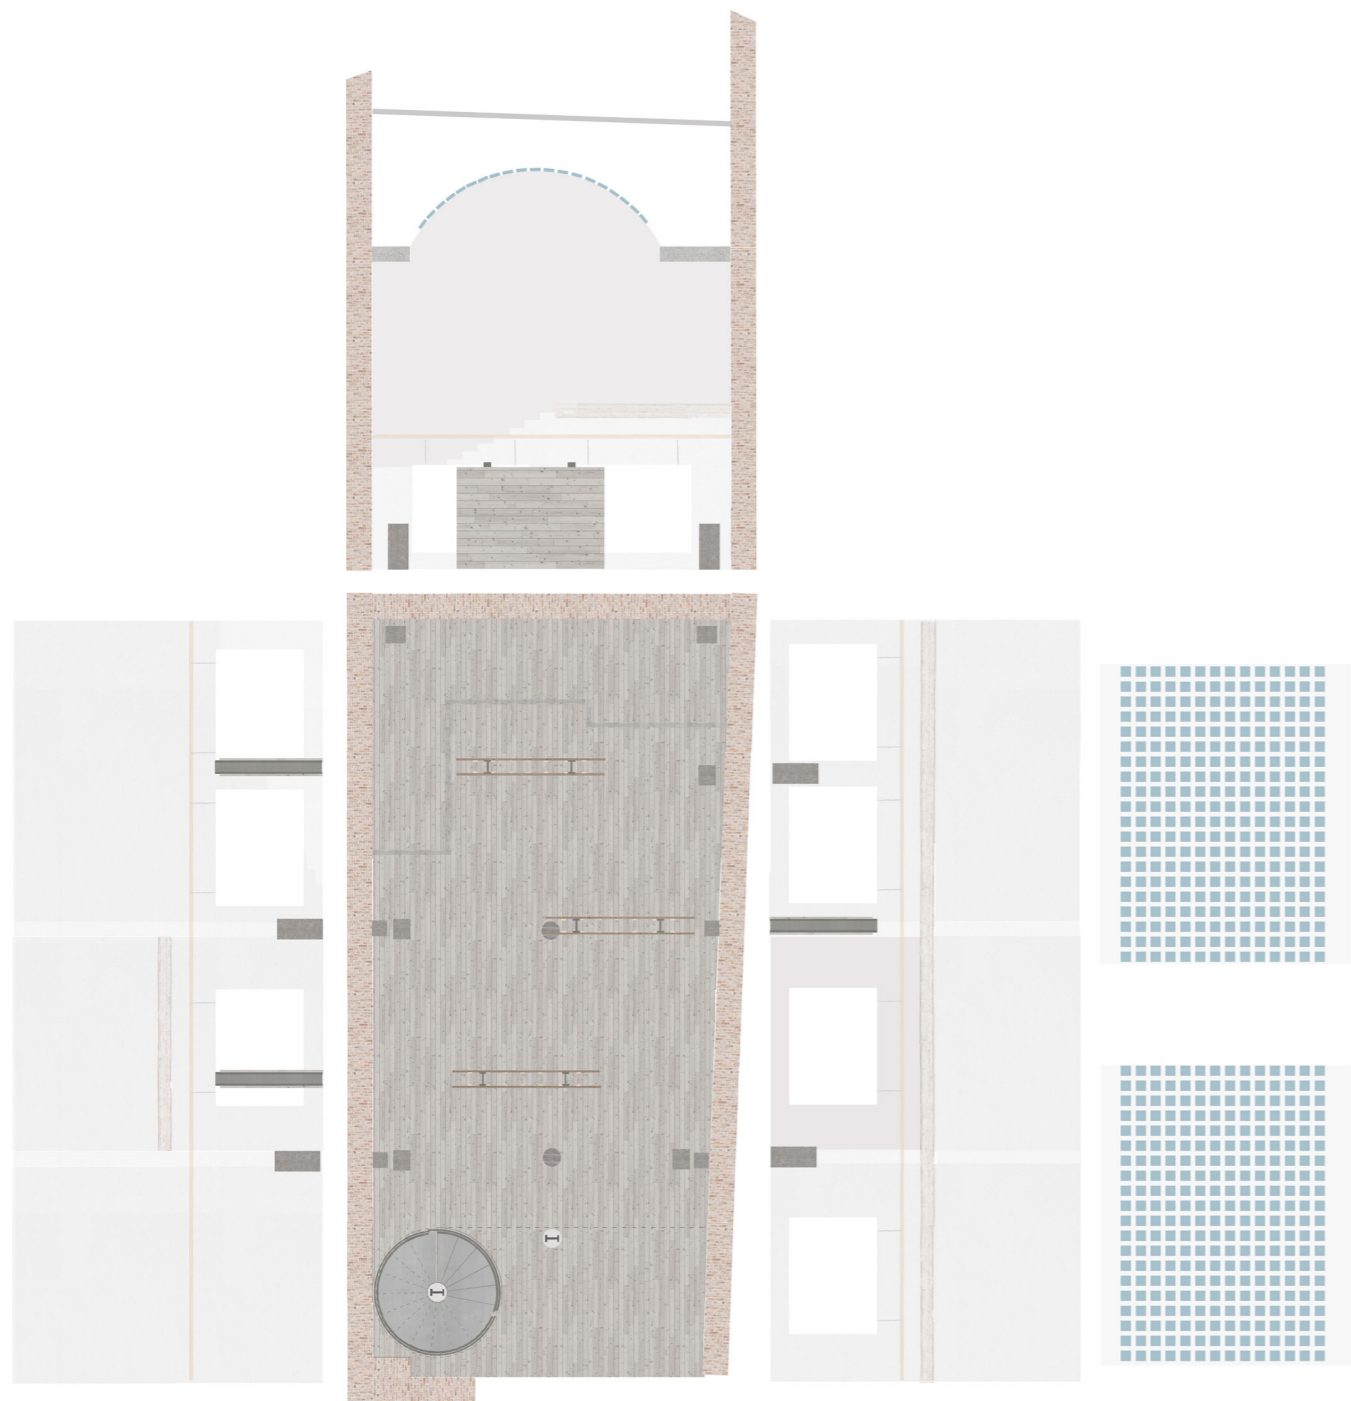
Unfolded plan after transformation. First floor. Scale 1:150
